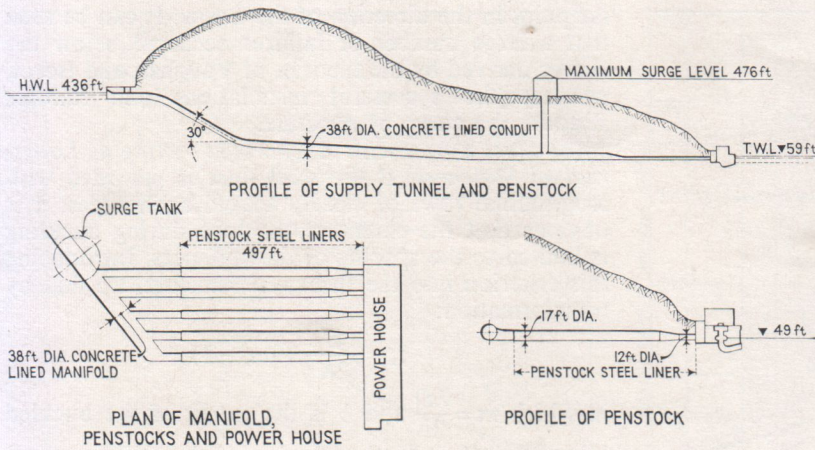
Arrangement of pressure conduits at Bersimis No. 2
